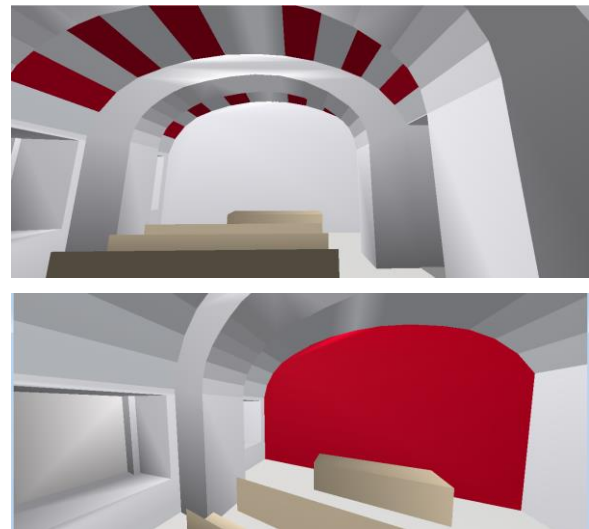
Panels under ceiling or on the wall behind teacher in the room P3
